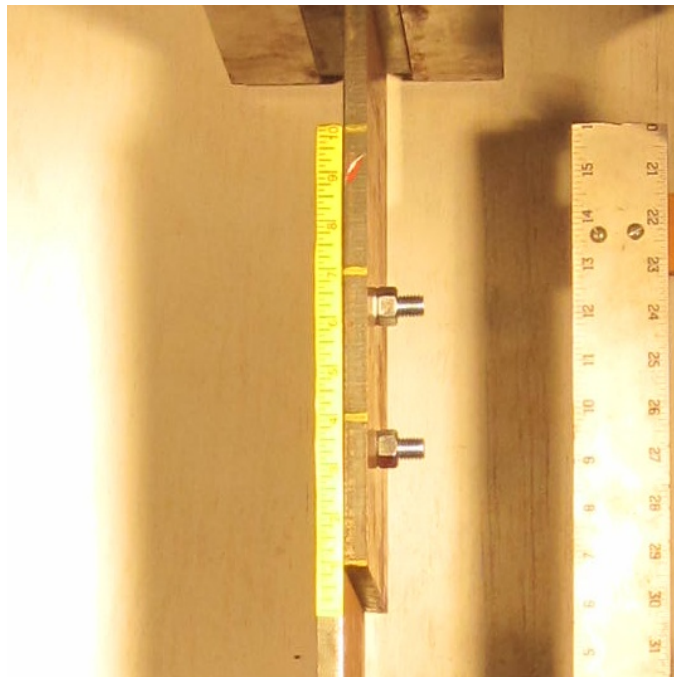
Typical Joint Configuration 3, Bolted, Single Shear Specimen.
